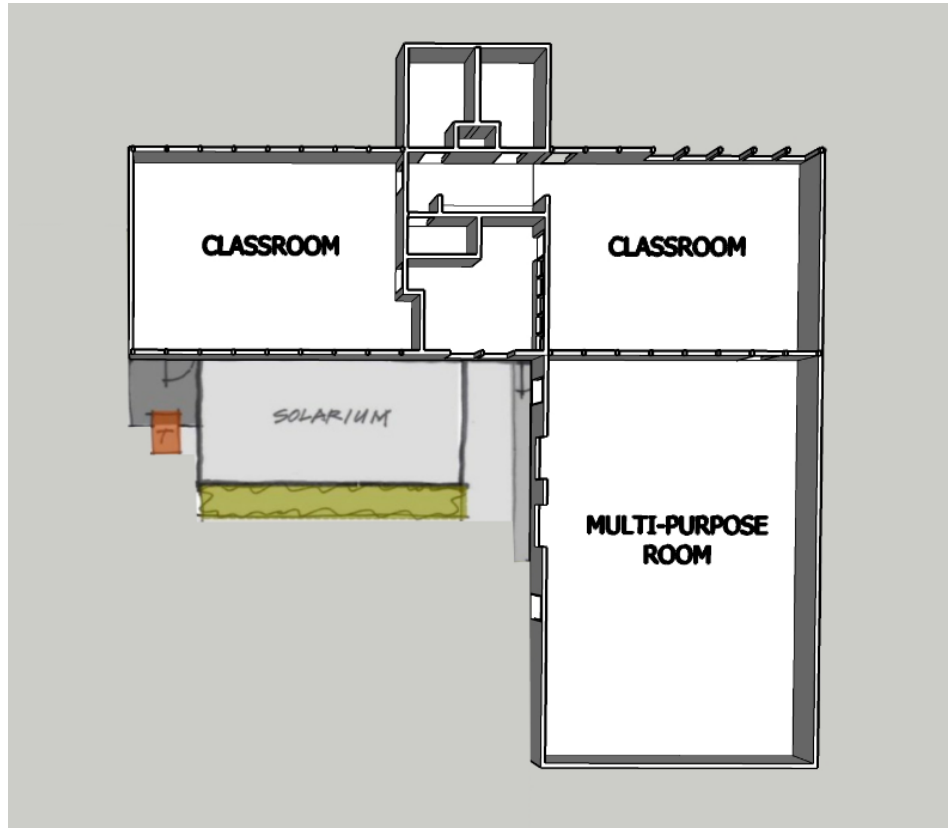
EXISTING SCHOOL FLOOR PLAN
